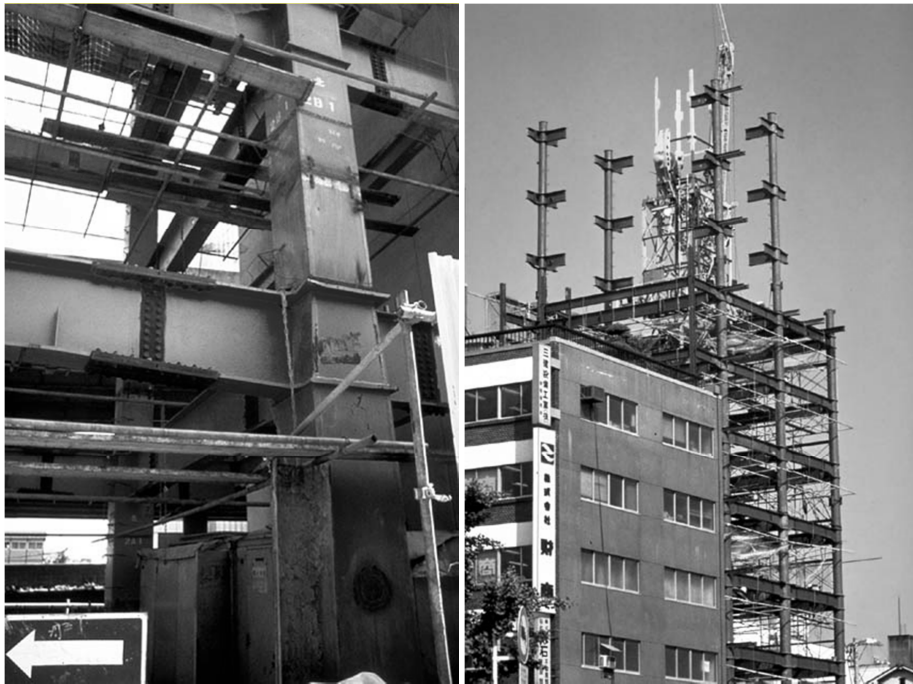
Buildings Erected applying the “Column Tree” Technique
